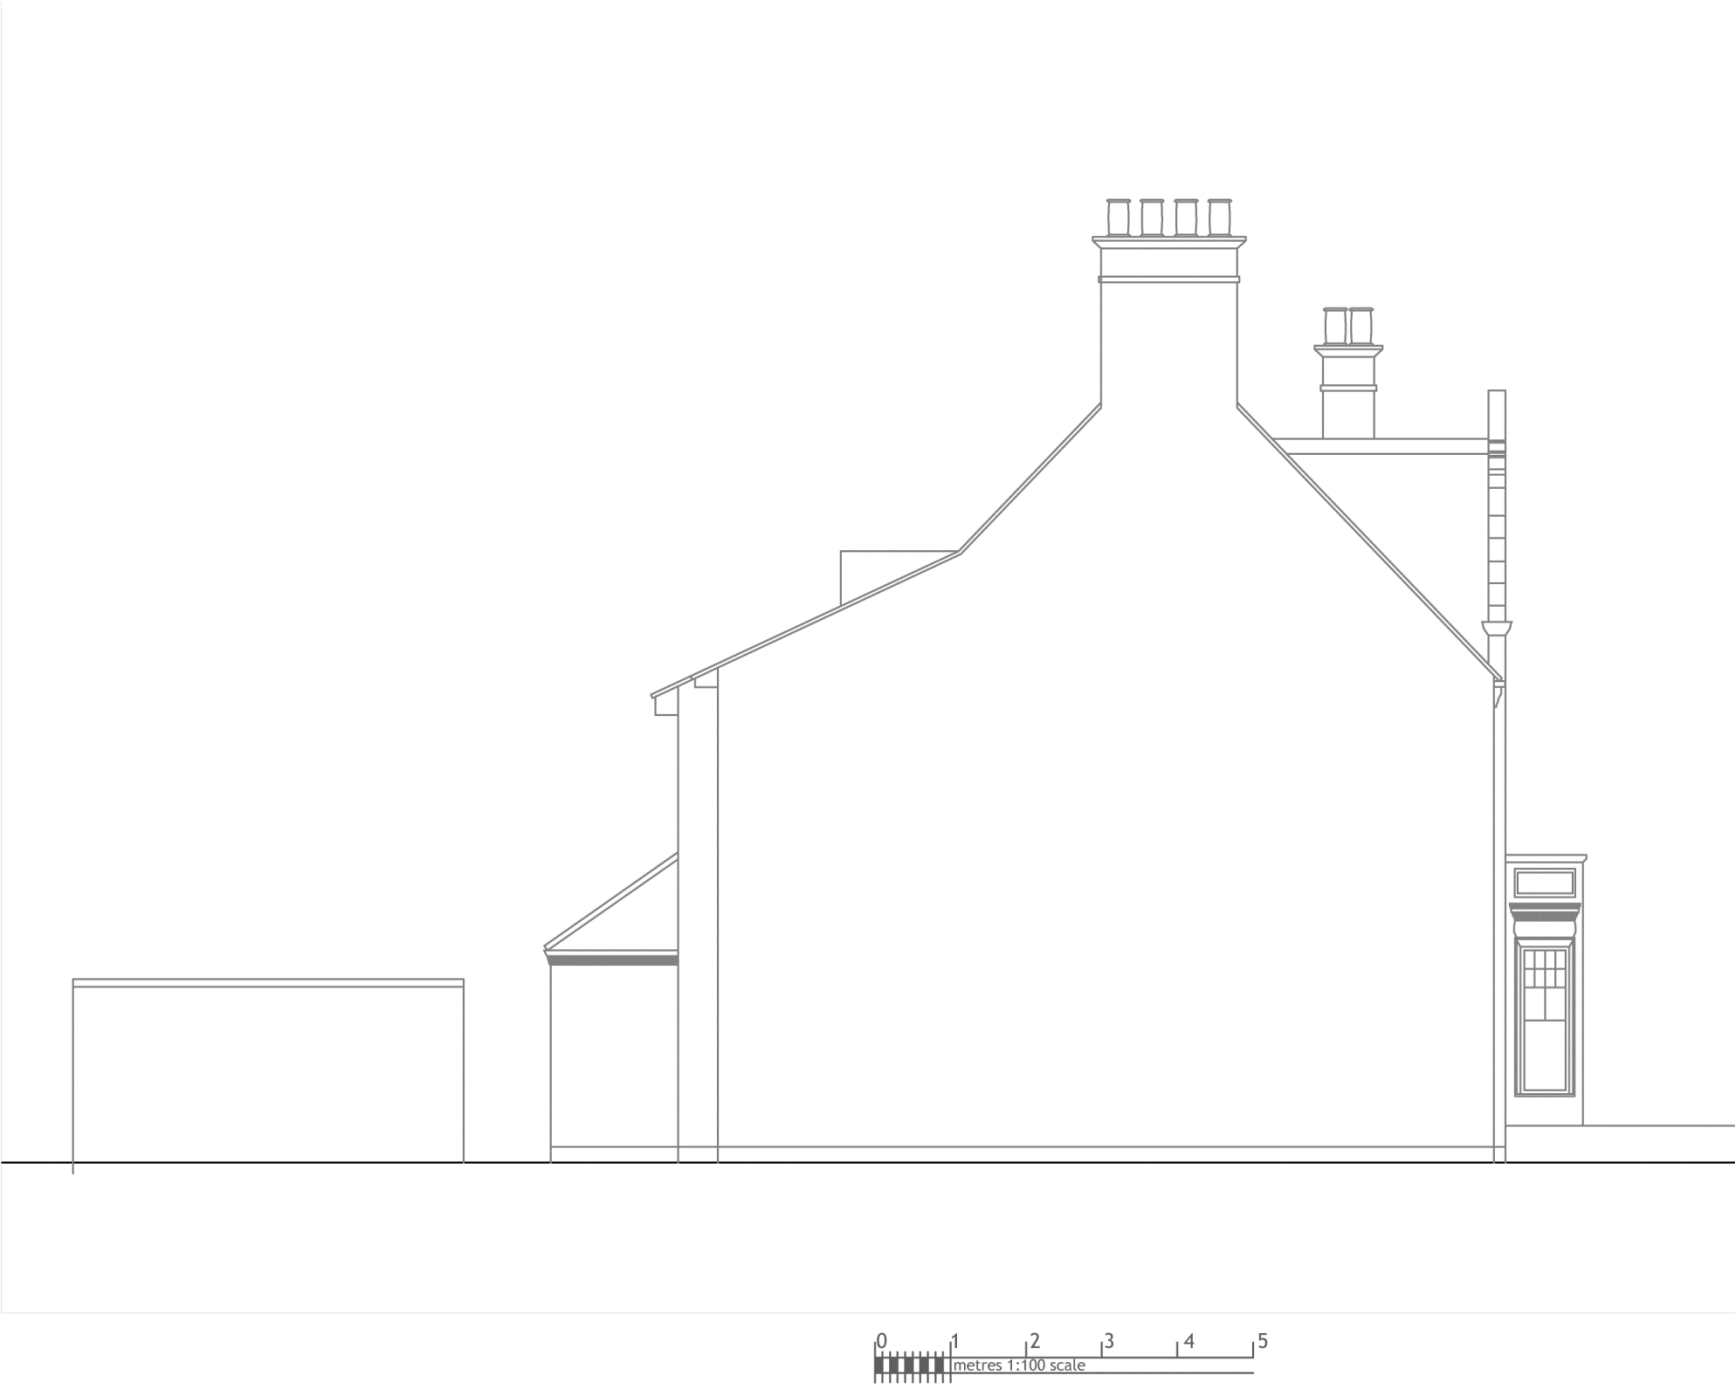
Existing side (south) elevation (scale as shown: 1:100@A3)
